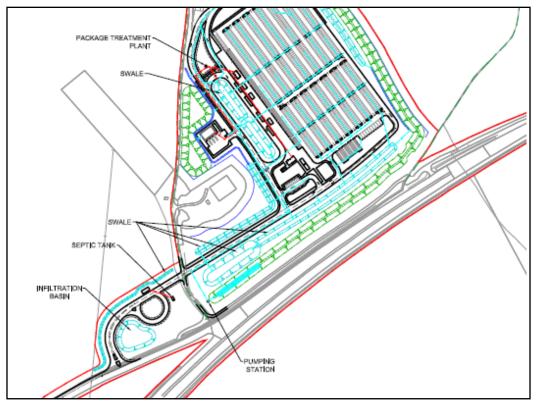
Southern park and ride internal layout showing concept drainage infrastructure to the north
